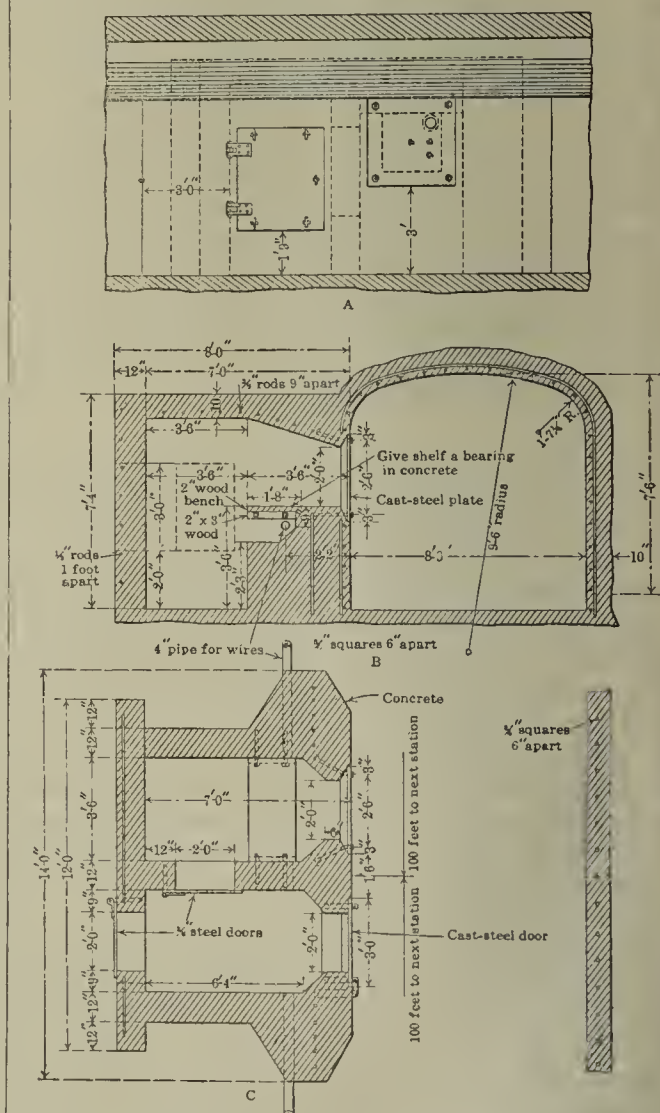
CONSTRUCTION OF INSTRUMENT CHAMBER. A, front elevator; B, vertical section; C, plan.
